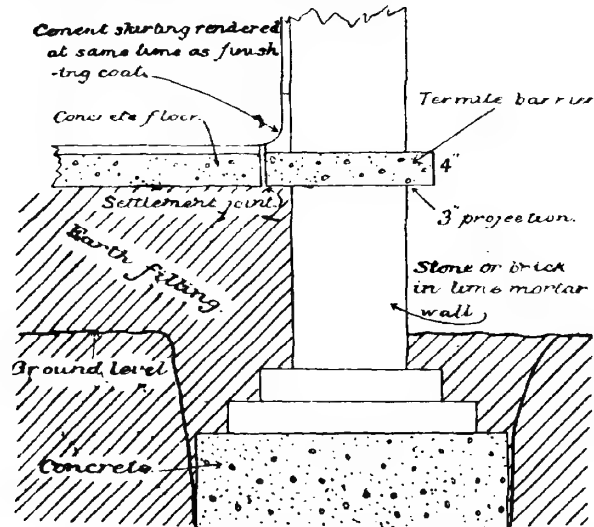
Foundation wall showing position of a concrete termite-barrier with reference to a concrete floor above earth filling and cement surfacing (adapted from Jepson and Woodeson).
